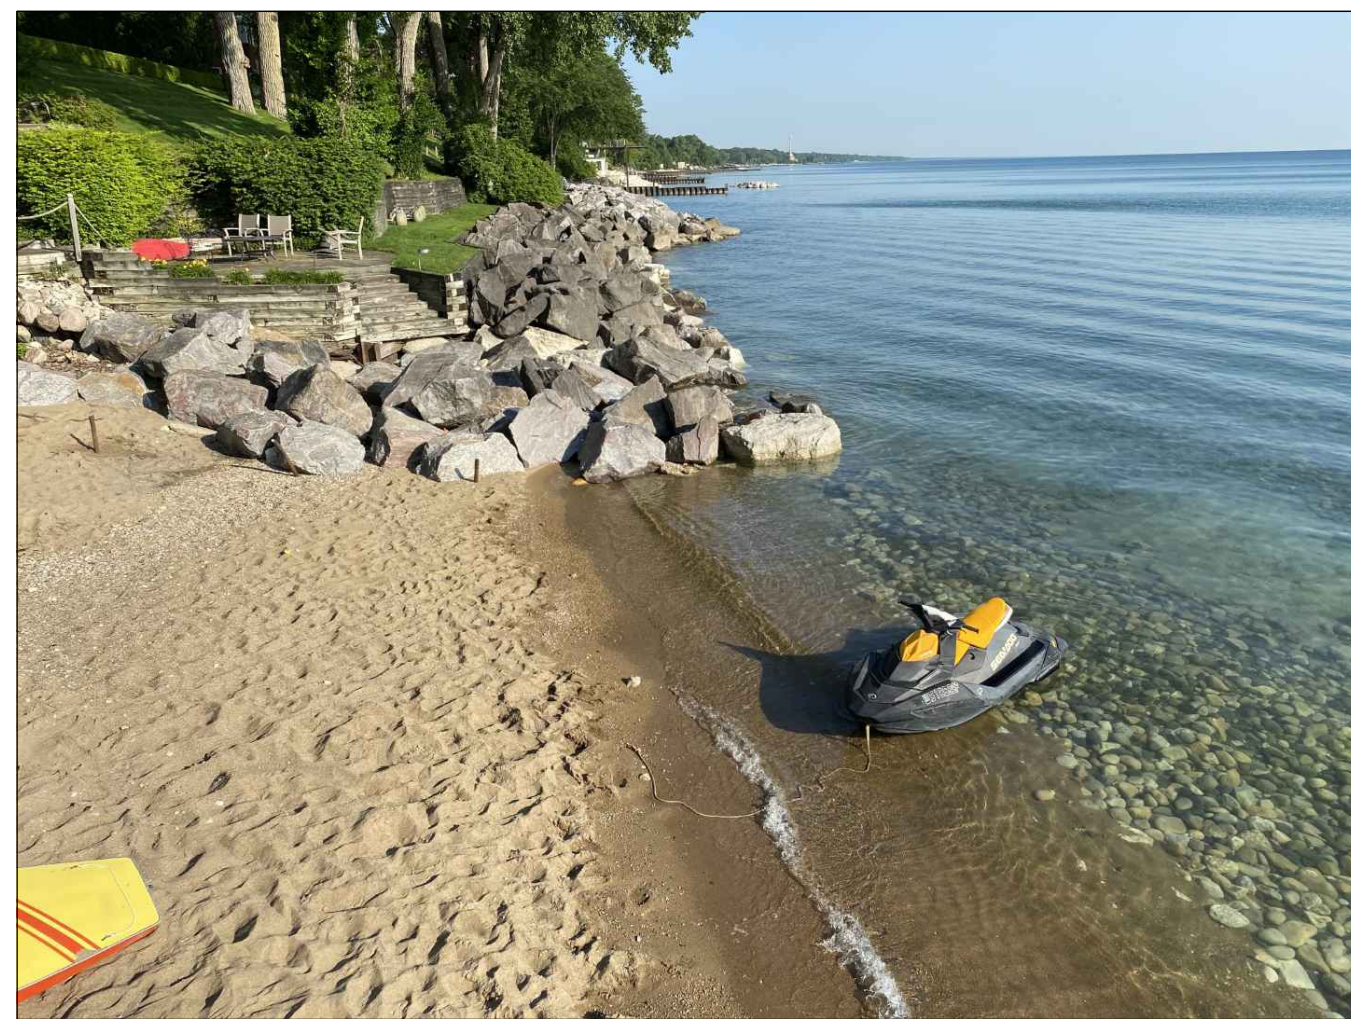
LOOKING NORTHWEST AT NORTH BEACH AND BOAT ACCESS.
